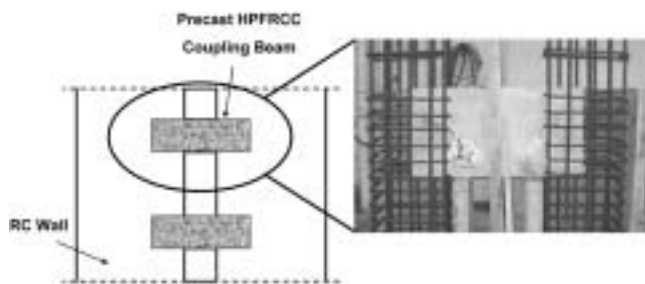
Use of precast high-performance fiber-reinforced cement composite coupling beams.
